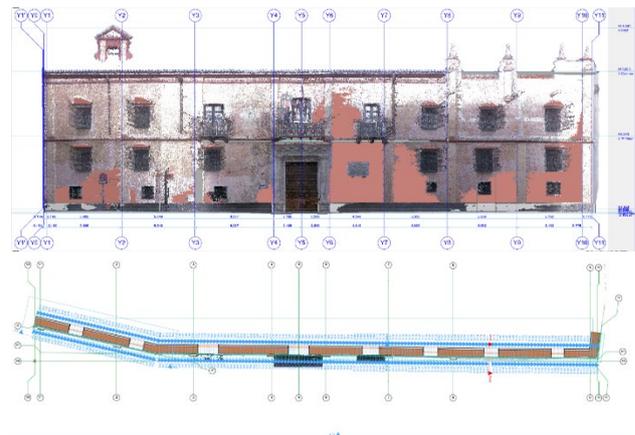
Elevation and floor plan of the Façade of the Miguel de Mañara Palace, superimposing the cloud of points with the parametric wall (red) in its theoretical position (0° collapse).
